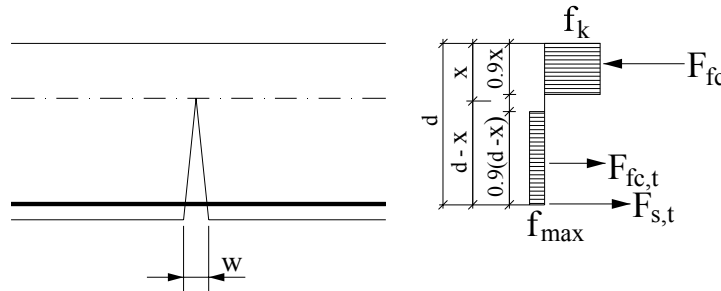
Simplified flexural model for fibre reinforced concrete [18]
